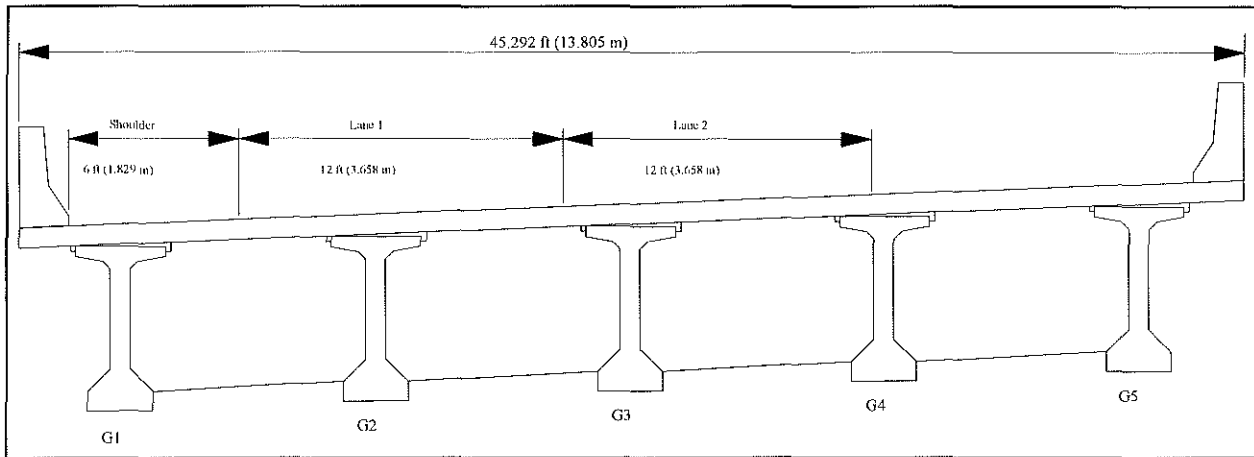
Cross Section of Southbound US 23 Bridge (Bridge With Intermediate Diaphragms) Illustrating Location of Traffic Lanes and Girder Number.
